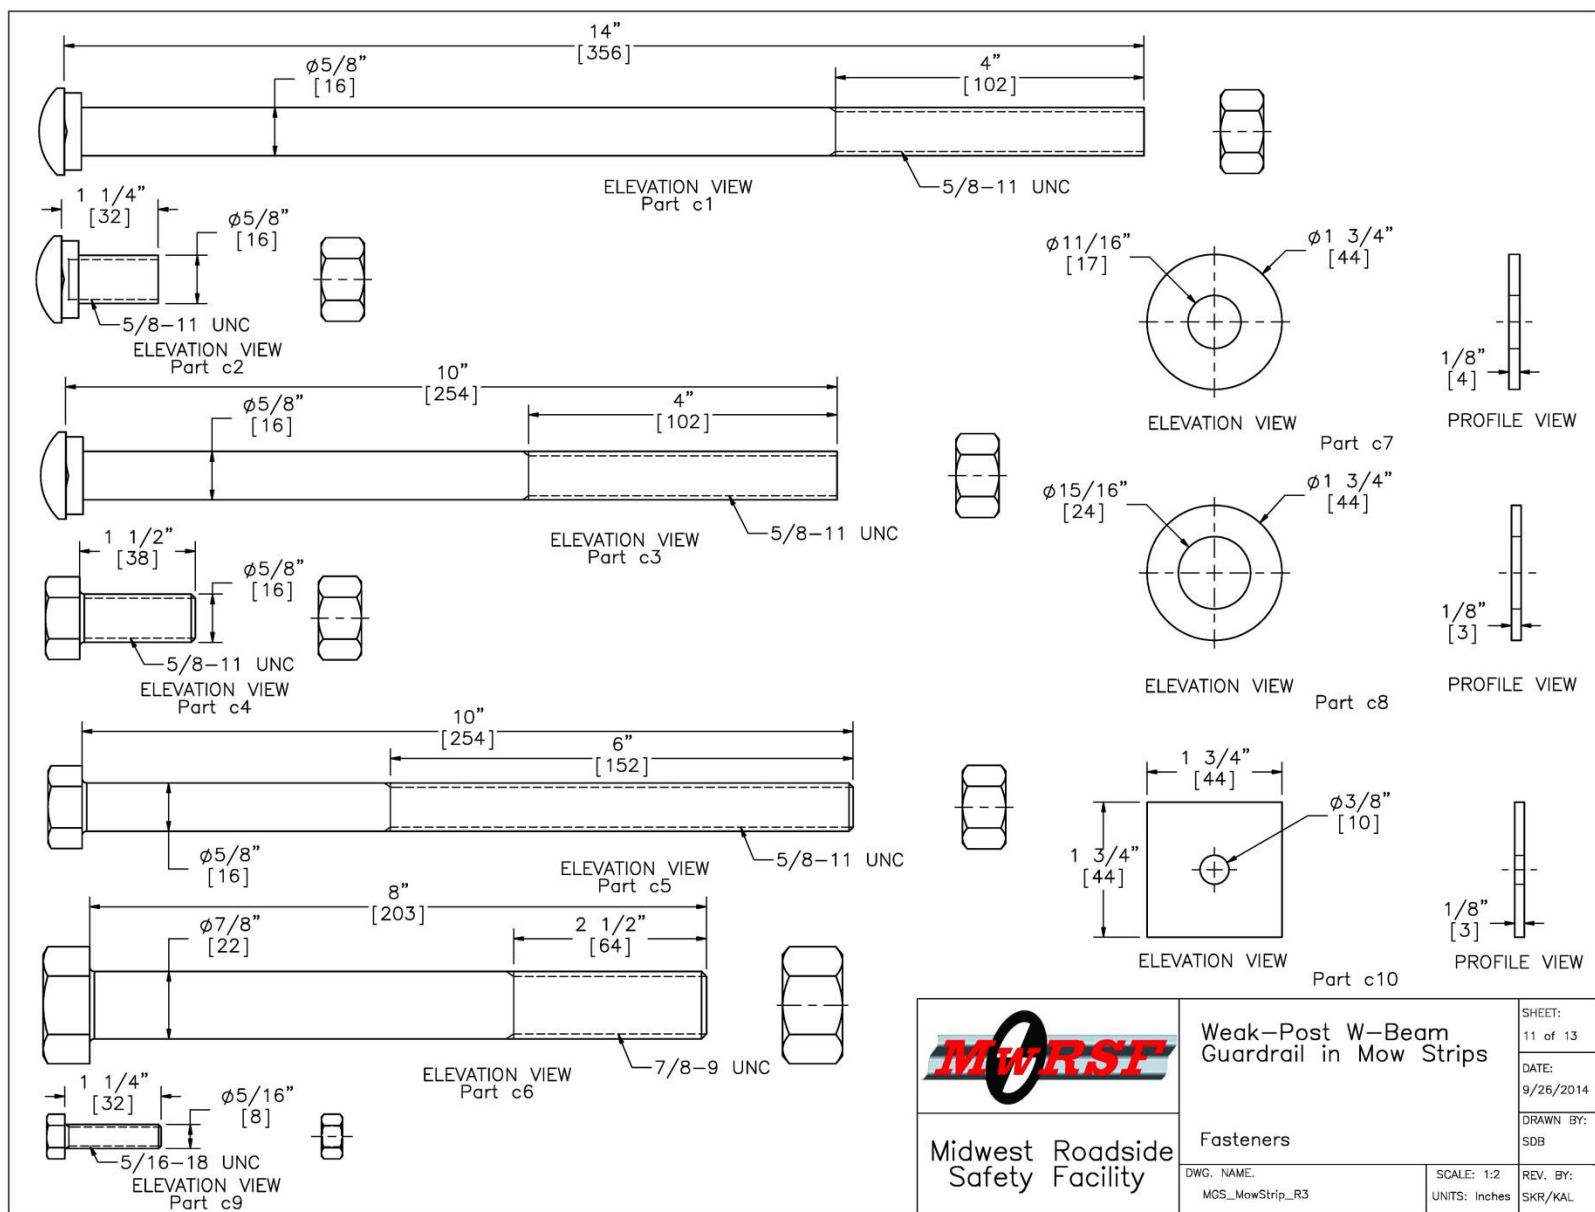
Attachment Hardware Details, Test No. MGSMS-1
